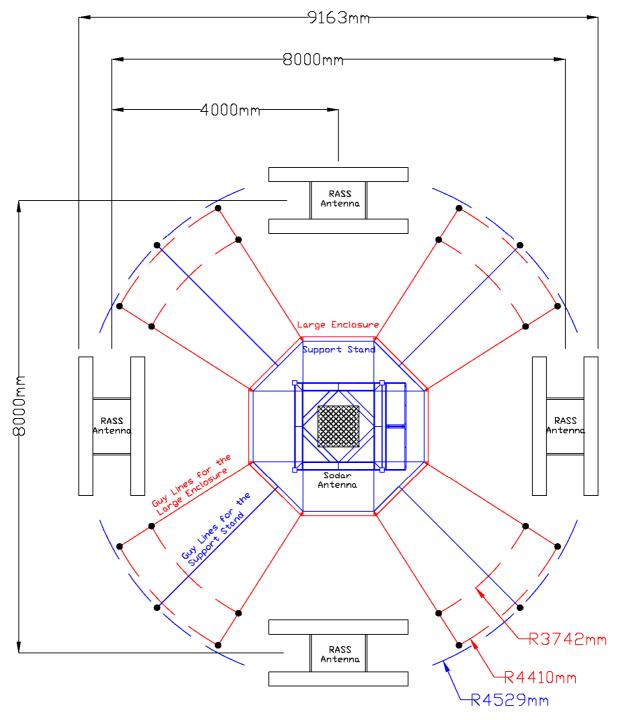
Overall dimension of MFAS/windRASS system with large enclosure (red) or support stand (blue)
